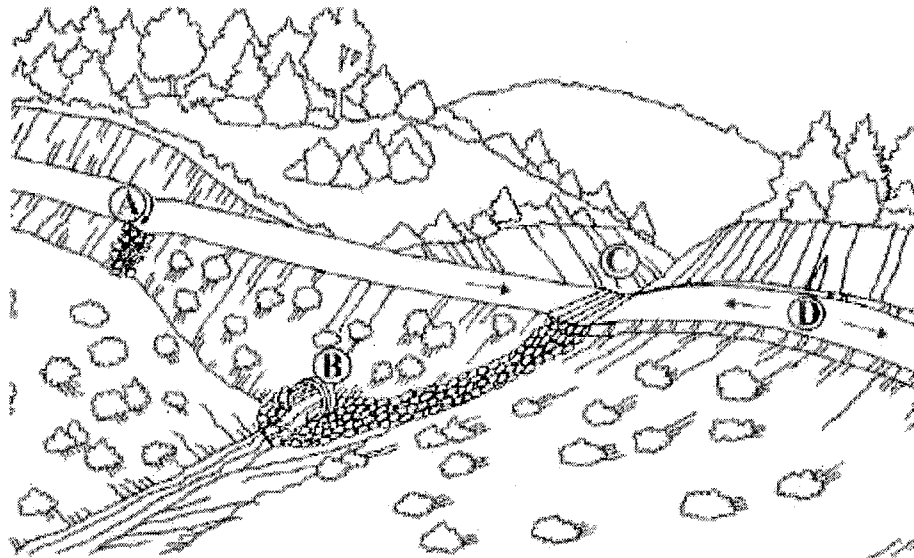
Critical dips or dipped crossing fills should be centered near a stream crossing's down-road hinge line, not over the centerline of the crossing where overtopping could cause washout or severe erosion of the fill. If the stream crossing culvert (B) plugs, water will pond behind the fill until reaching the critical dip or low point in the crossing (C) and flowing back down into the natural stream channel. The down-road ditch must be plugged to prevent streamflow from diverting down the ditch line. For extra protection in this sketch, riprap armor has been placed at the critical dip outfall and extending downslope to the stream channel. This is only required or suggested on stream crossings where the culvert is highly likely to plug and the crossing fill overtopped. The dip at the hinge line is usually sufficient to limit erosional damage during an overtopping event. Road surface and ditch runoff is disconnected from the stream crossing by installing a rolling dip and ditch relief culvert just up-road from the crossing (A) (Keller and Sherar, 2003).
